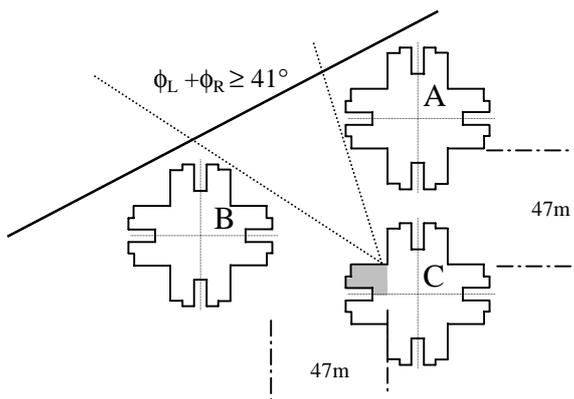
Site layout and block spacing based on an external obstruction of 40° on both axes.
